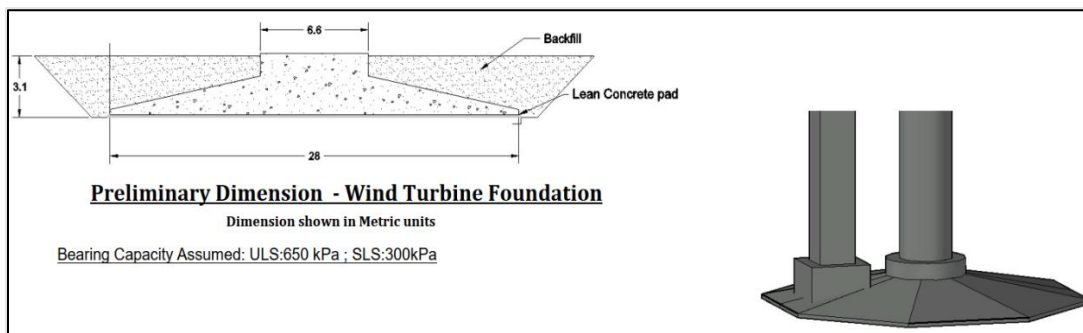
Combined Concrete Foundation for Tower Crane and Turbine with no Ground Water Schematic
